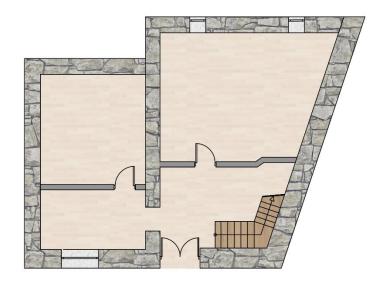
Beqiri, A. (2024) Lluke Zanati House Ground Floor plan
